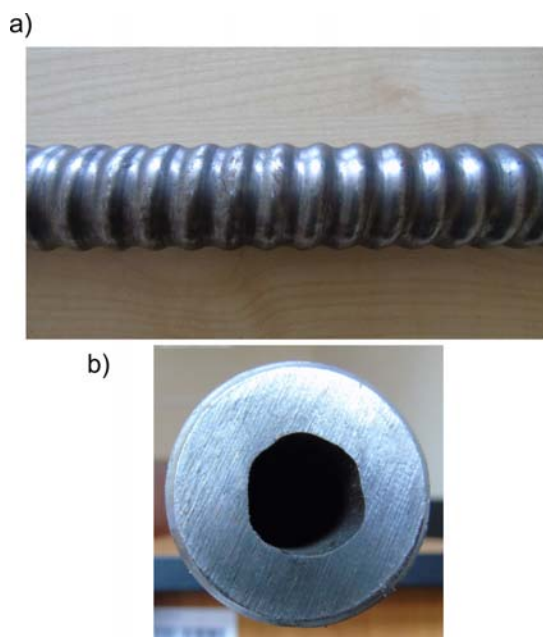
Photograph of a) single self-drilling hollow bar and b) its cross section
